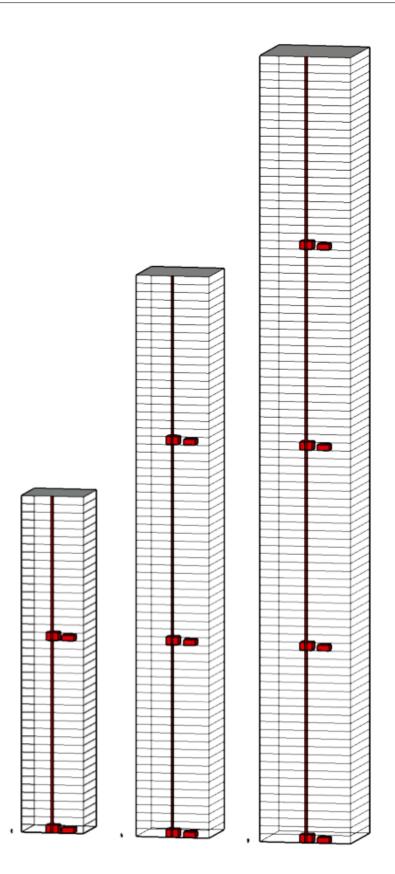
Buildings 1,2 and 3. Sprinkler sectioning with pump rooms and water tanks marked in red. A person is placed at the bottom left of the building for scale.
